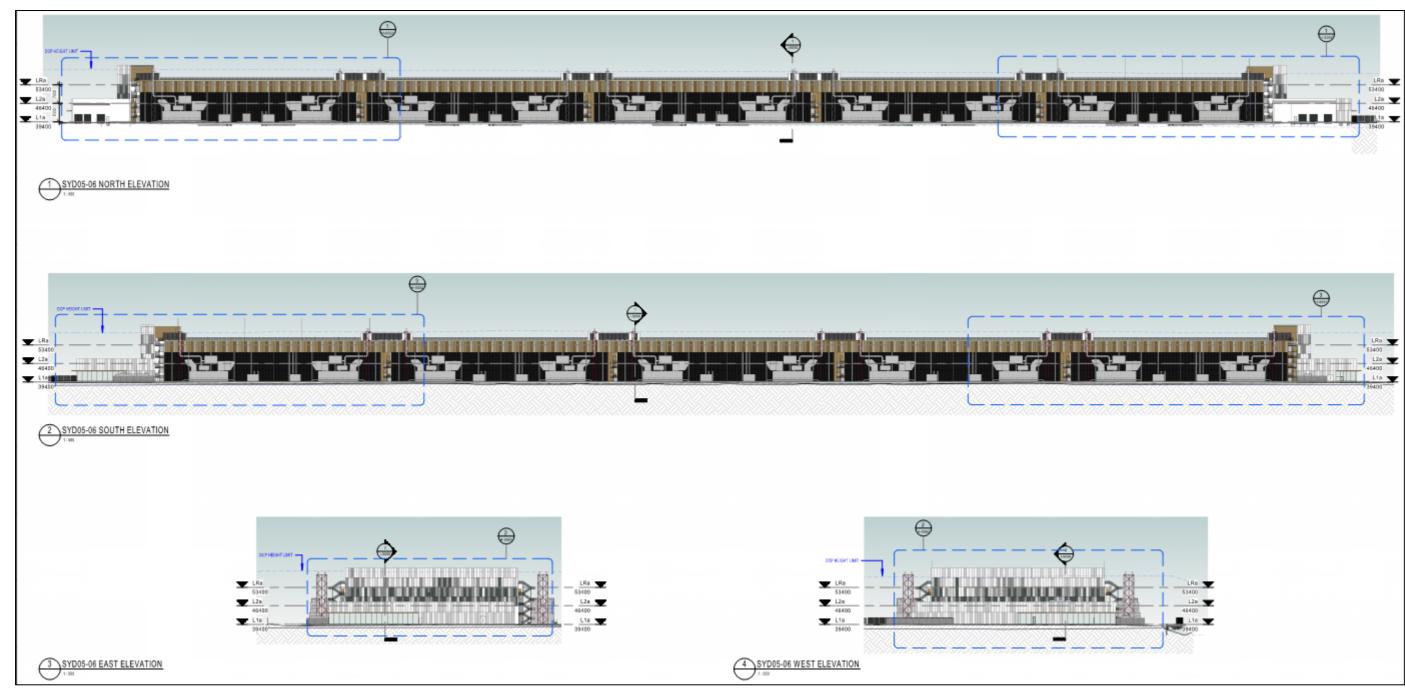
Proposed Elevations Pertaining to SYD05 & 06 (Source: Greenbox Architecture, 2021)
